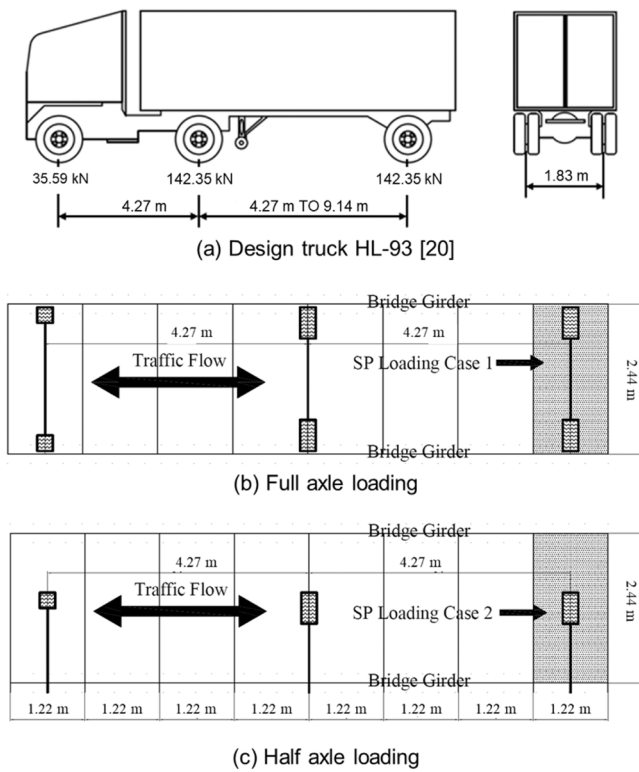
Characteristics of the design truck HL-93 (a), orientation of sandwich panels on bridge superstructure and loading configurations for full axle loading (load case 1) (b) and half axle loading (load case 2) (c).
